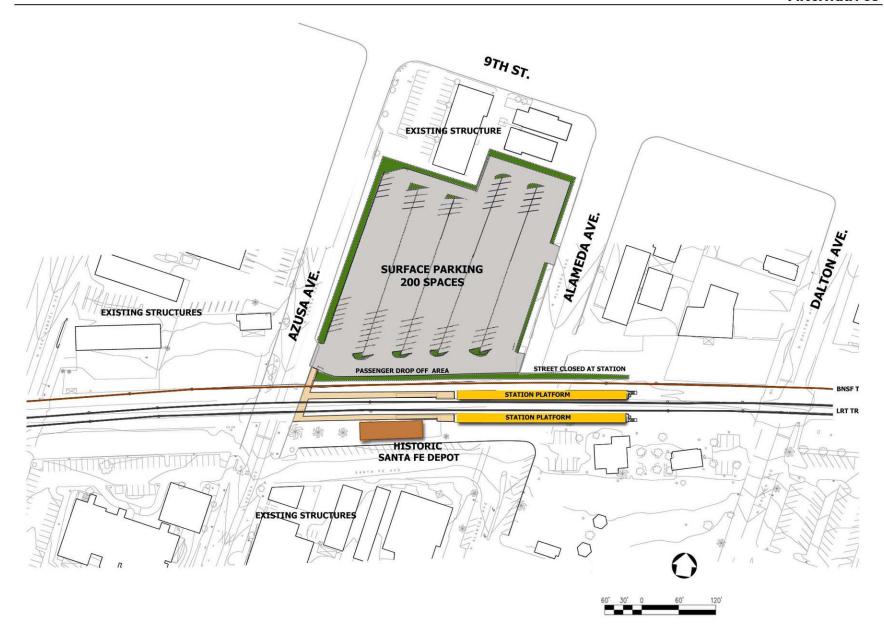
Site Plan: City of Azusa, Alameda Avenue Station
